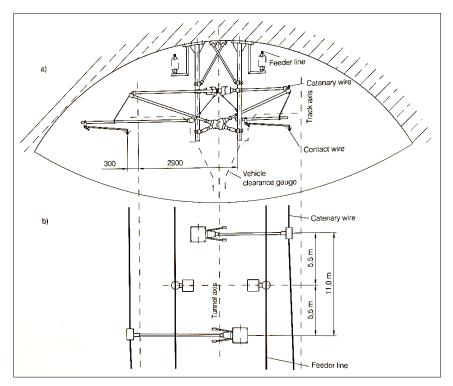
Supports in rectangular tunnels with cross section view and view from the top.
